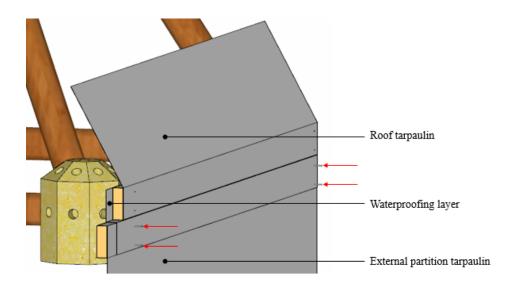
3D sketch showing the nailing of the external partition beam to the roof structure -1
